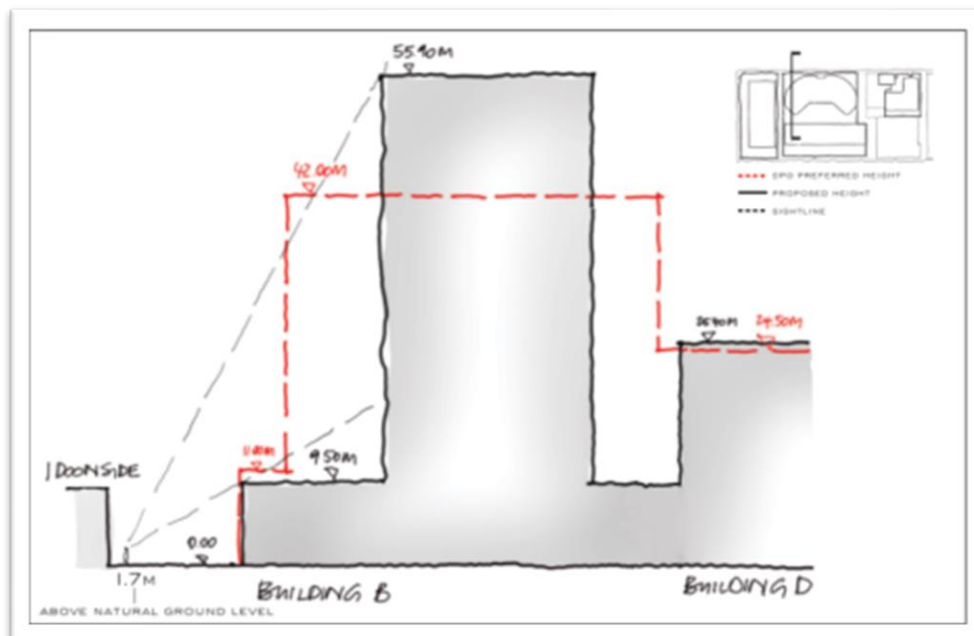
Sightline diagram from Doonside Street to Building B. Source: Development Plan (Gurner 2023)
